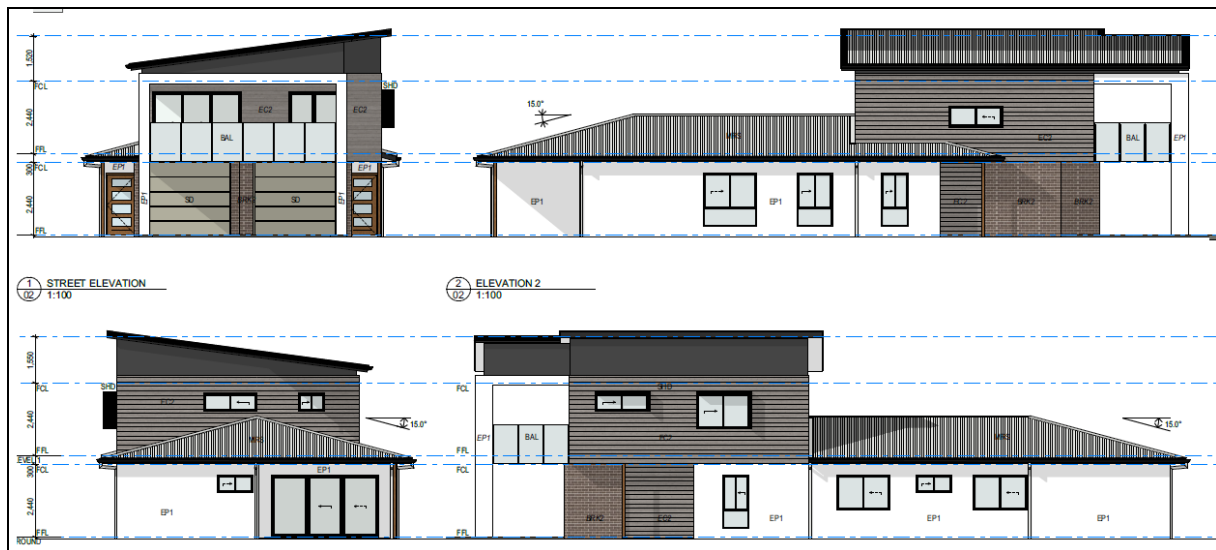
Type 1 (Option B) elevations (Source: Ultra Linea Architecture)
